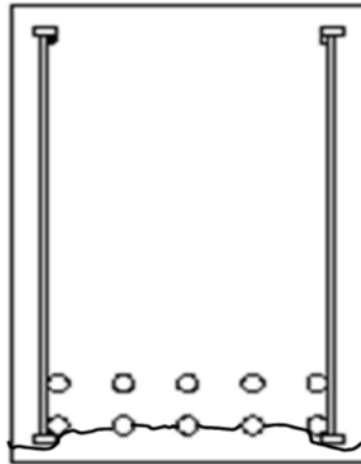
Splitting cracks not intercepted by headed deformed bars serving as transverse reinforcement.
